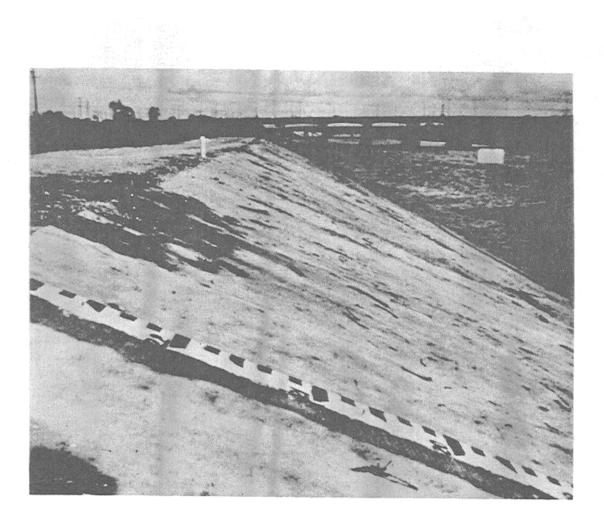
Aftermath, Flood of 16 February 1980, Los Angeles River below Wardlow Road, Long Beach (view toward downstream, showing debris at top of levee left by flood).
